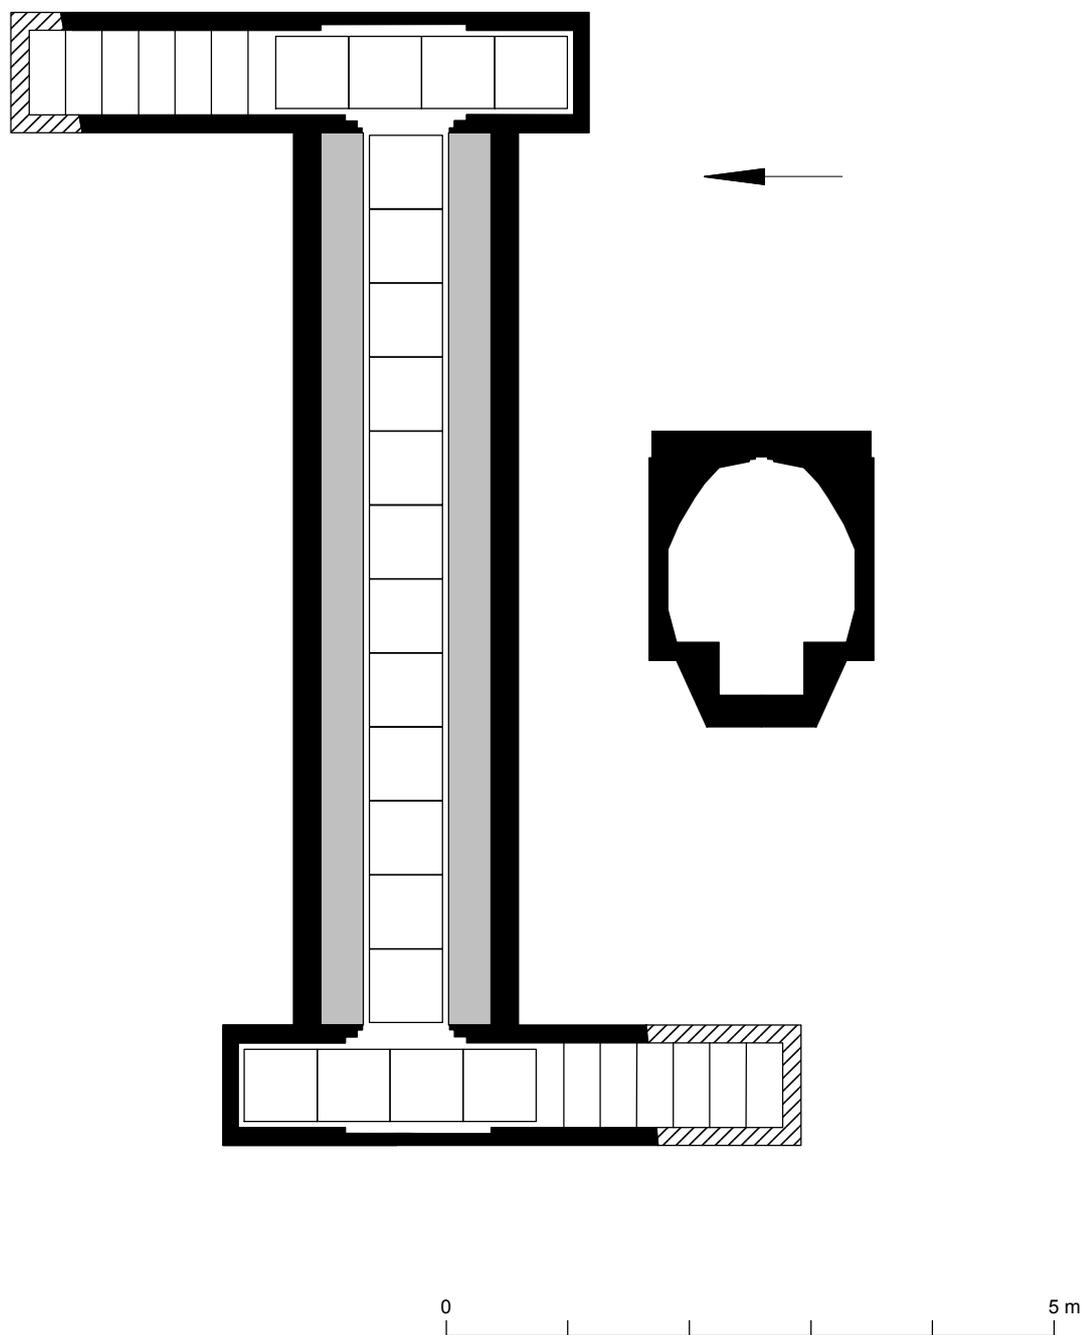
Development Area 7: air-raid shelter WBF82 - plan and cross-section.
